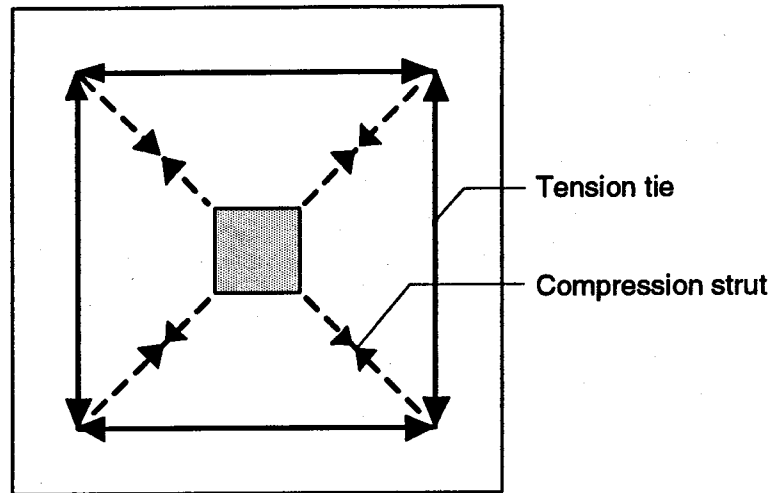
Square Hoop Behaviour of Interior Sandwich Plate with Unloaded Slab
